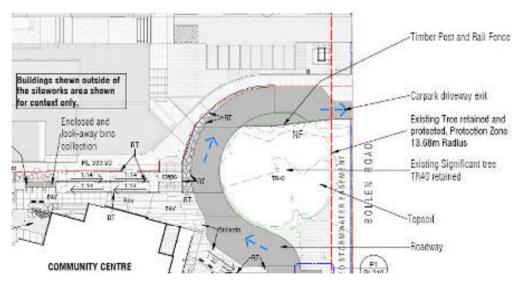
Figure B – extract Site Plan drawing PL204 – the proposed Stage 2 encroachment within the TPZ aligns with the encroachment of the existing driveway.
